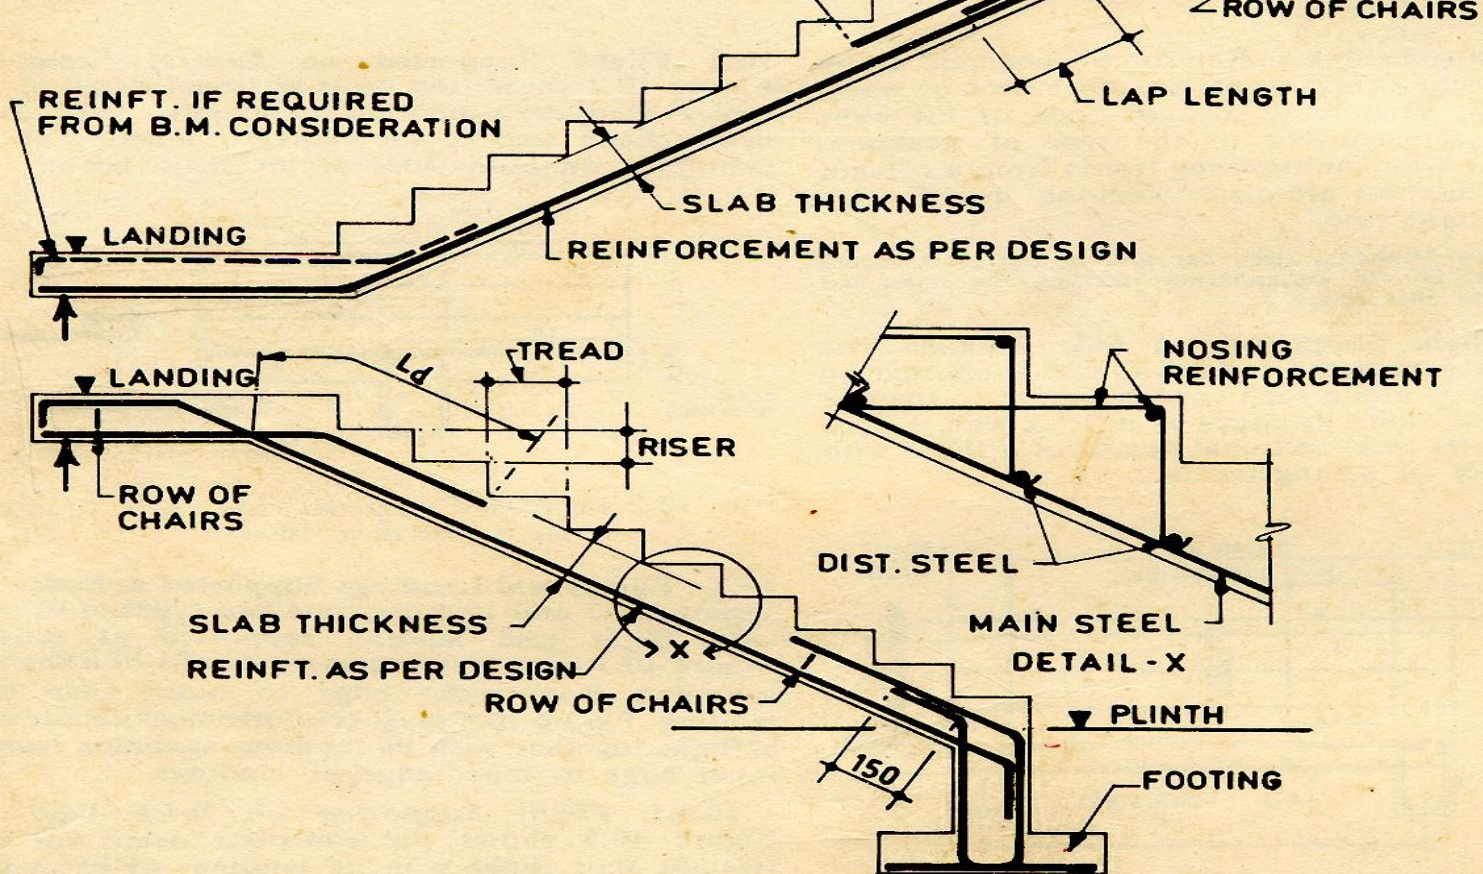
CROSS-SECTIONAL DETAILS OF A SINGLE SPAN STRAIGHT FLIGHT SUPPORTED ON BRICK WALLS
